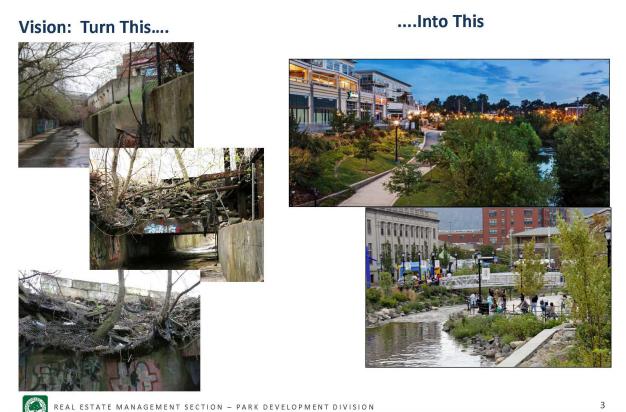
Kenwood Tributary outlet to the Willett Branch at River Road, adjacent to the Westwood Center II parking lot
